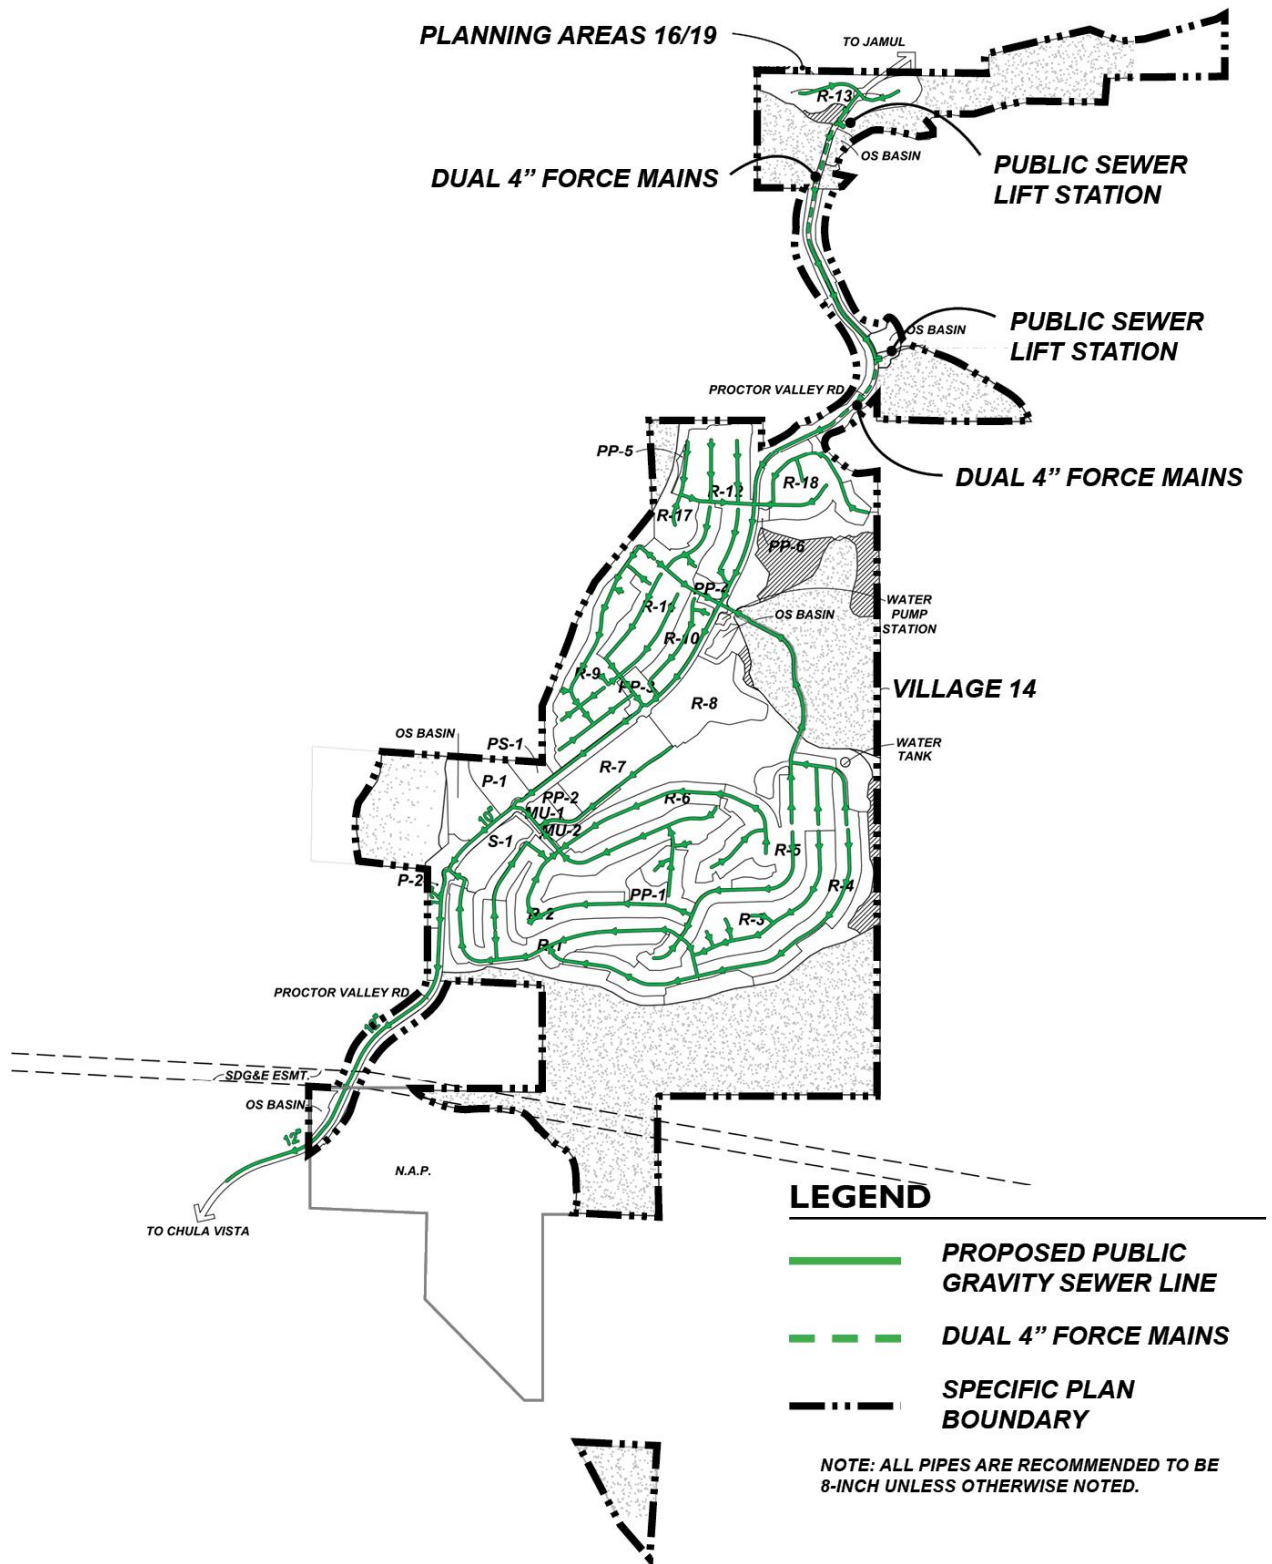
Conceptual Sewer Plan (On-Site)
